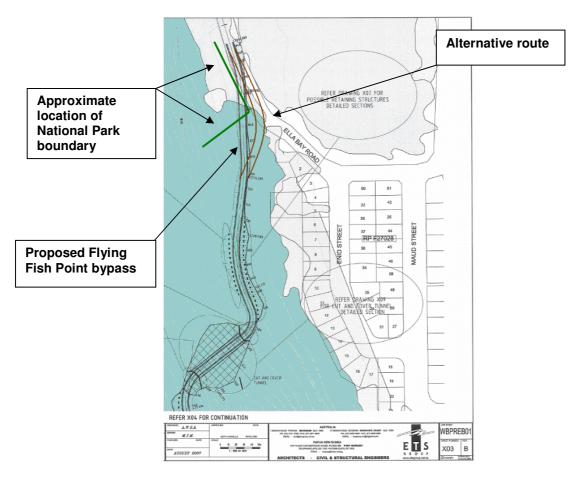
Flying Fish Point bypass to Ella Bay Road connection
